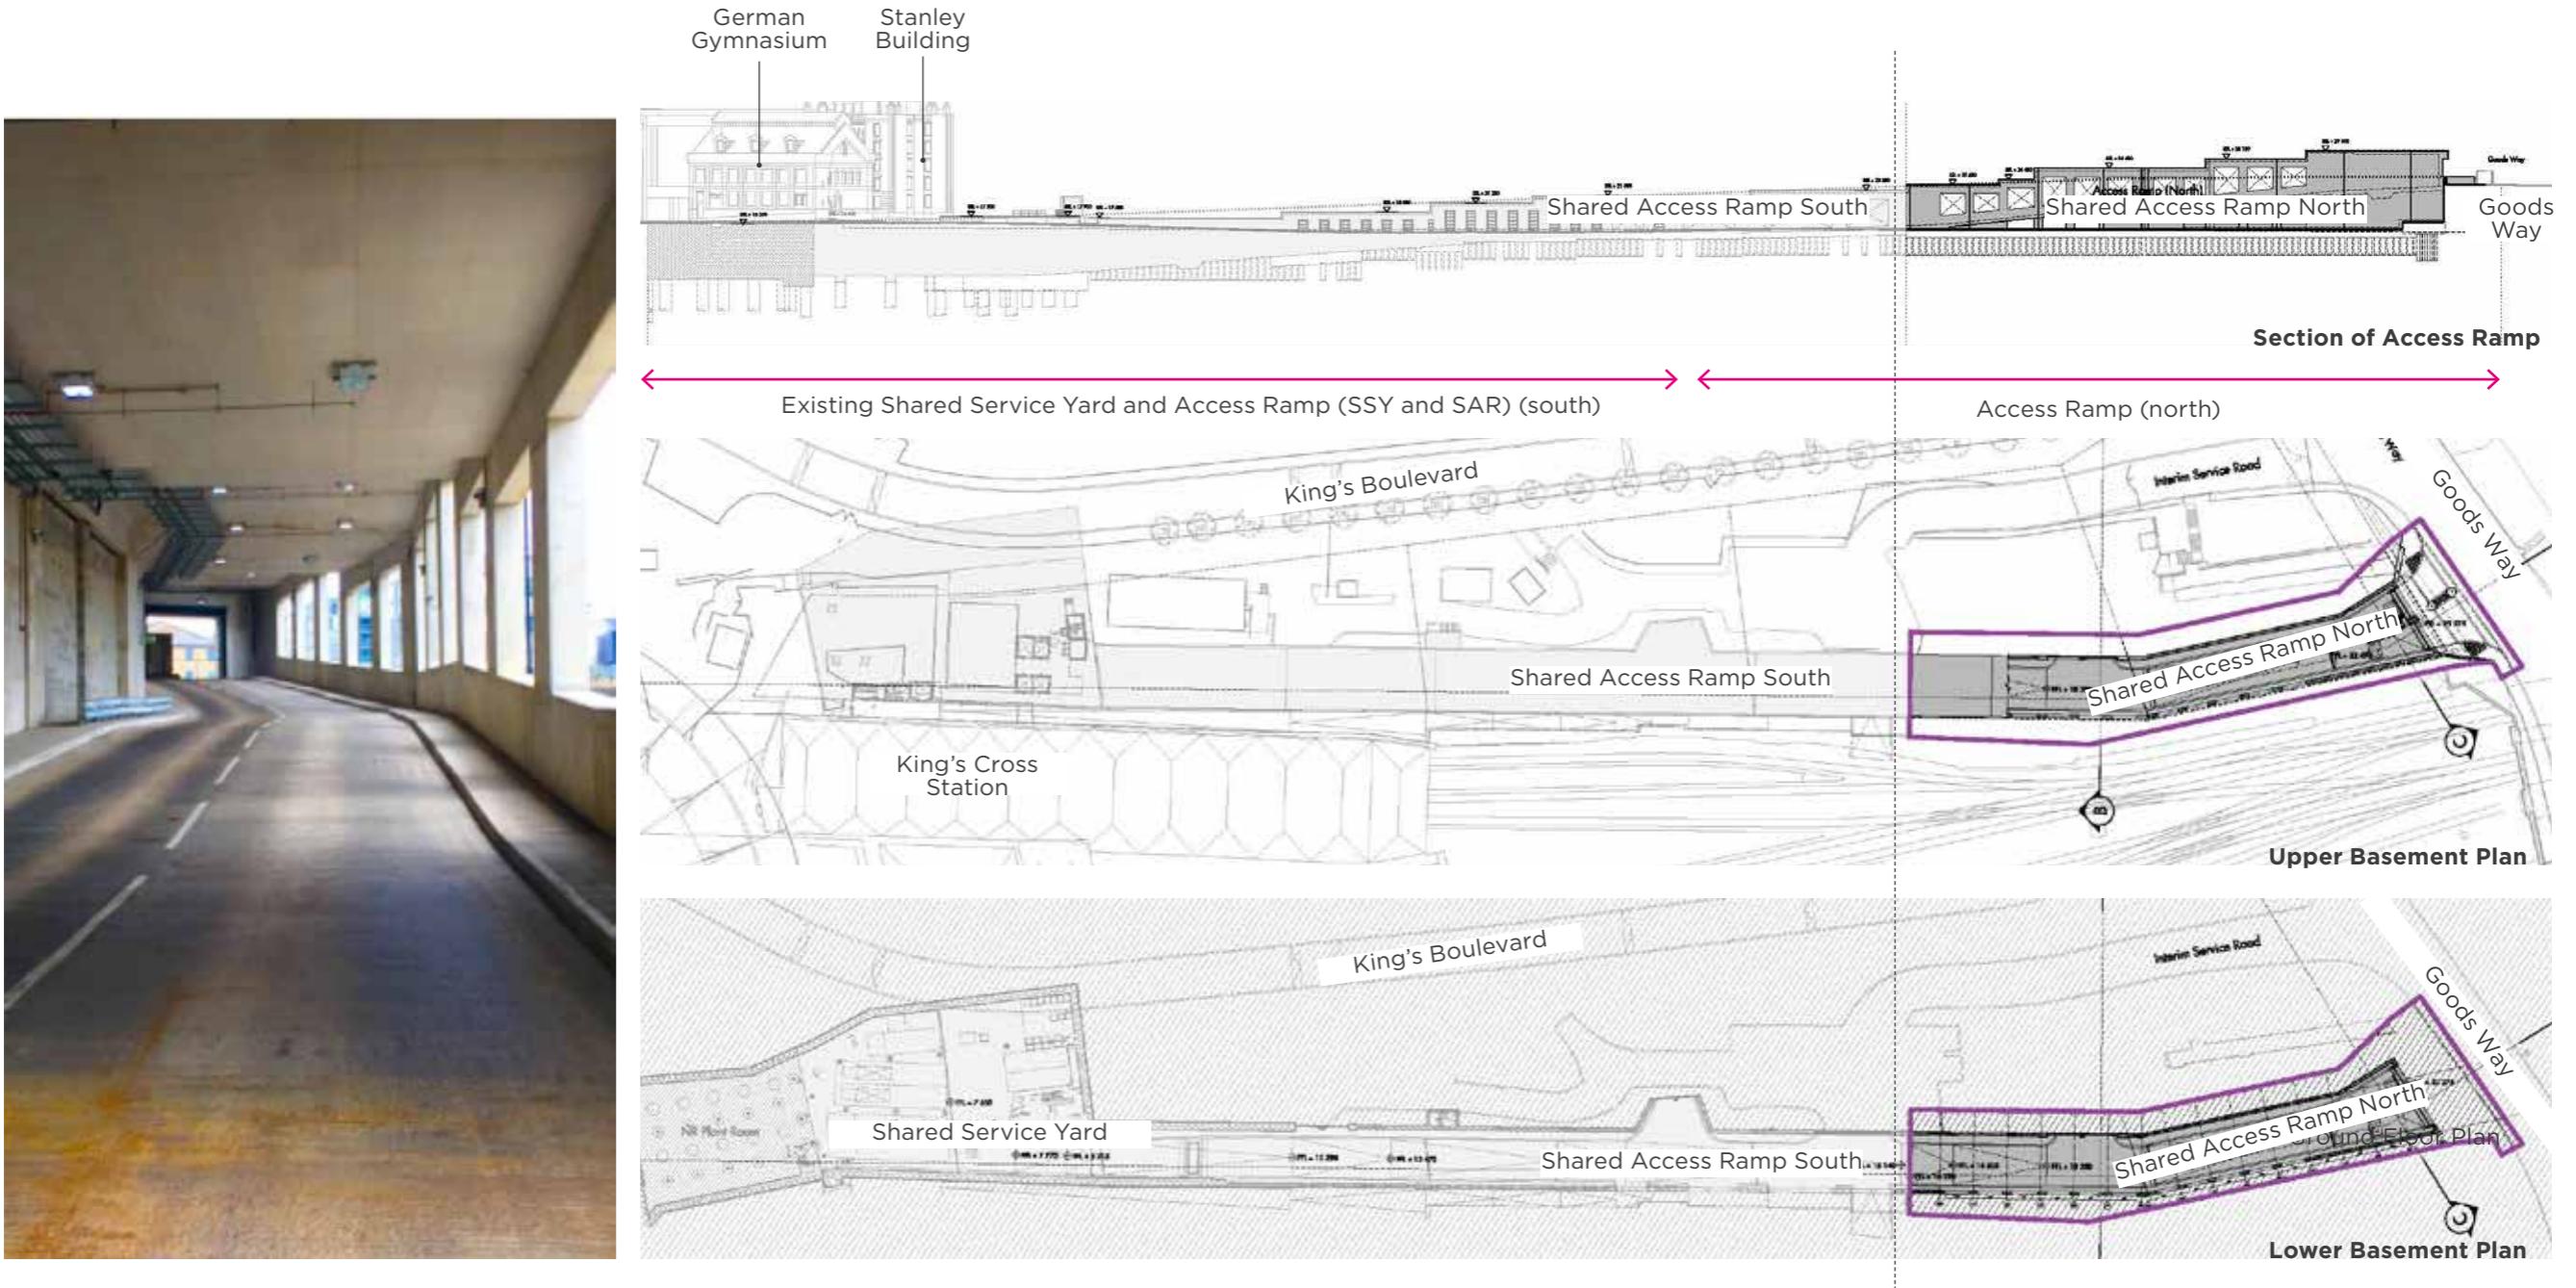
Photo of the completed Access Ramp to the basement of the building looking north and Section/Plans showing the approved Access Ramp
